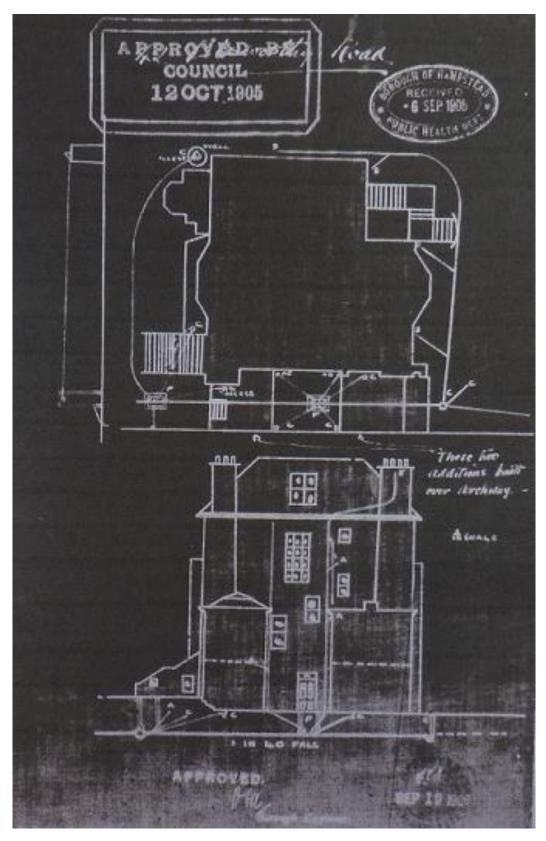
The block plan and east elevation of the house in 1905 from a drainage plan (Camden Local Studies)
